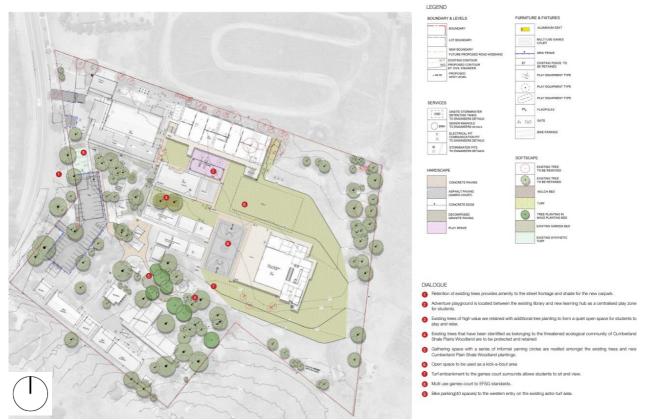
Landscape: Tree retention / removal plan (Source: Taylor Brammer)
